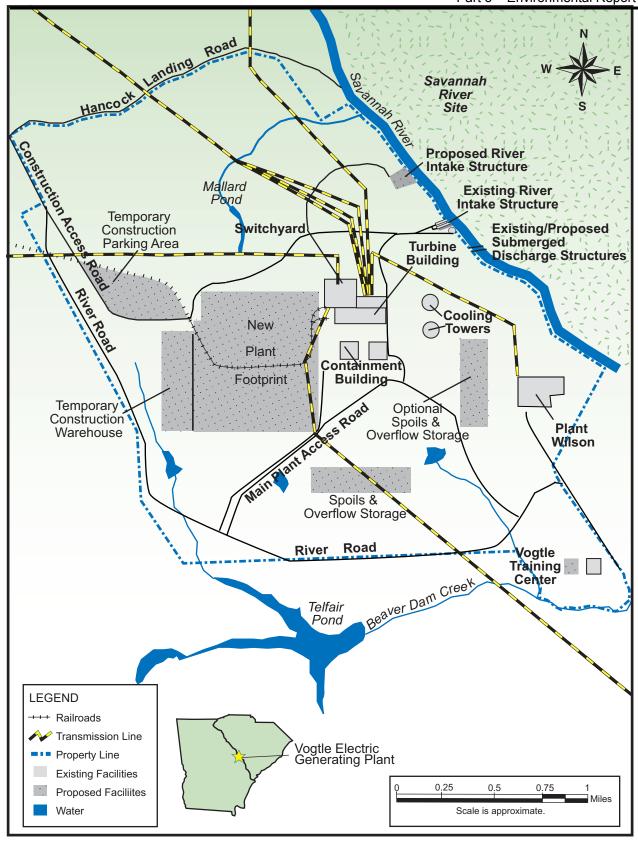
VEGP Site and Proposed New Plant Footprint
